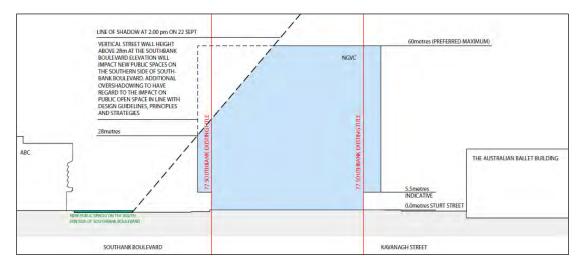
NGVC building projections over Southbank Boulevard (left) and Kavanagh Street (right)
